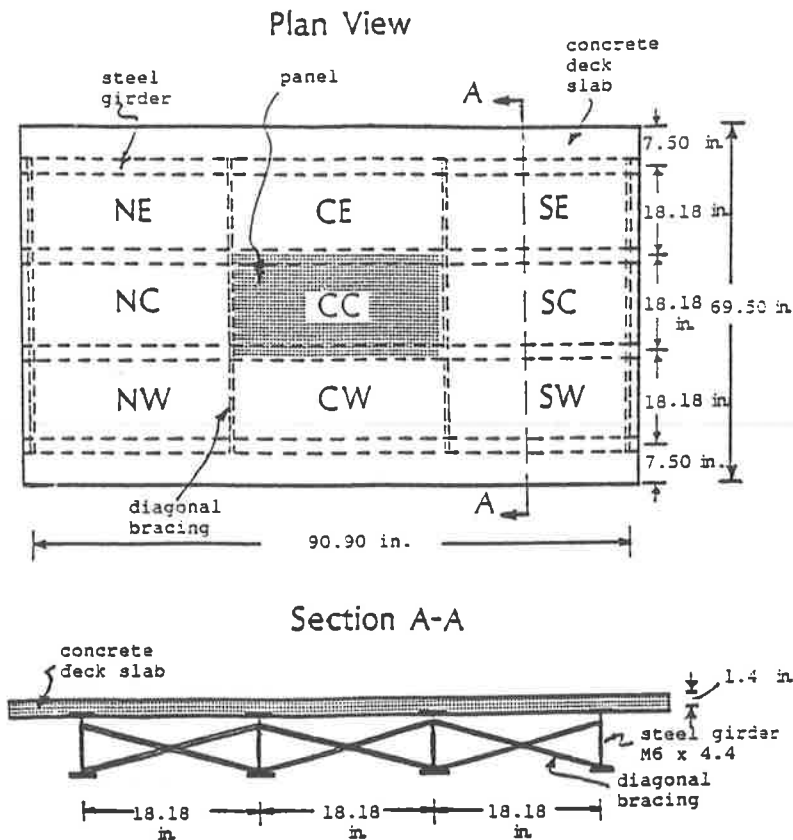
Dimensions for the 1/6.6 scale bridge deck model with a prototype girder spacing of 10 ft simply supported over a 50 ft span (1 in = 25.4 mm; 1 ft = 0.3 m).
